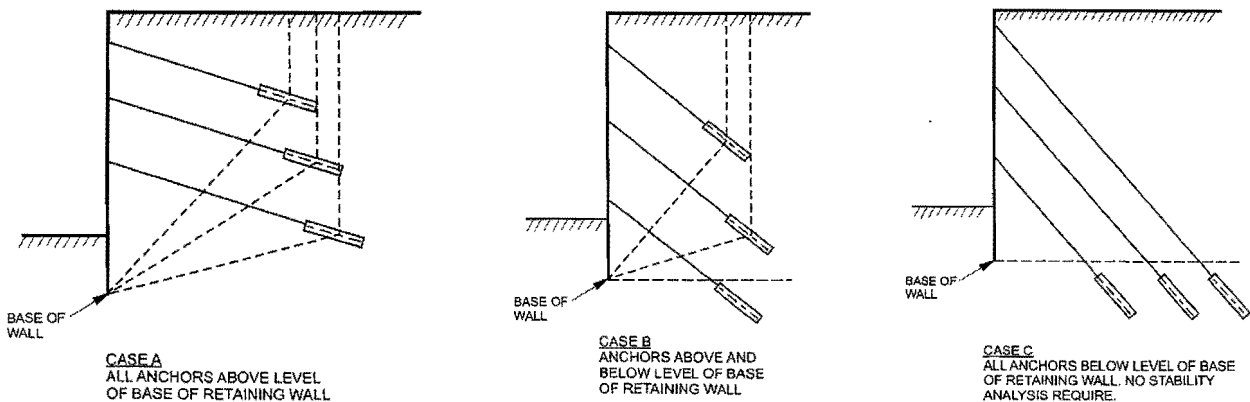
Typical multiple-level anchor systems showing potential failure planes requiring analysis
